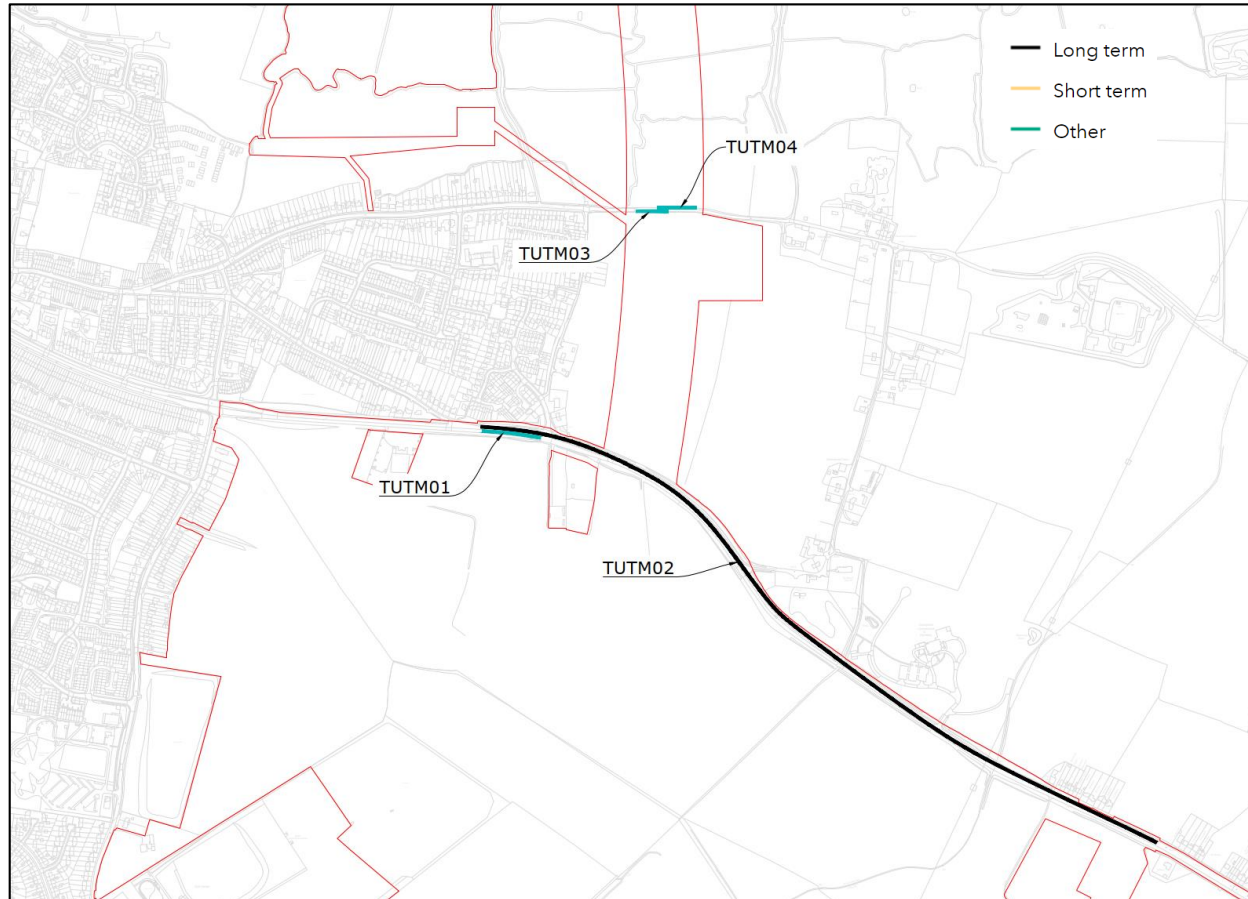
Tunnel traffic management measures location plan (2 of 2)
